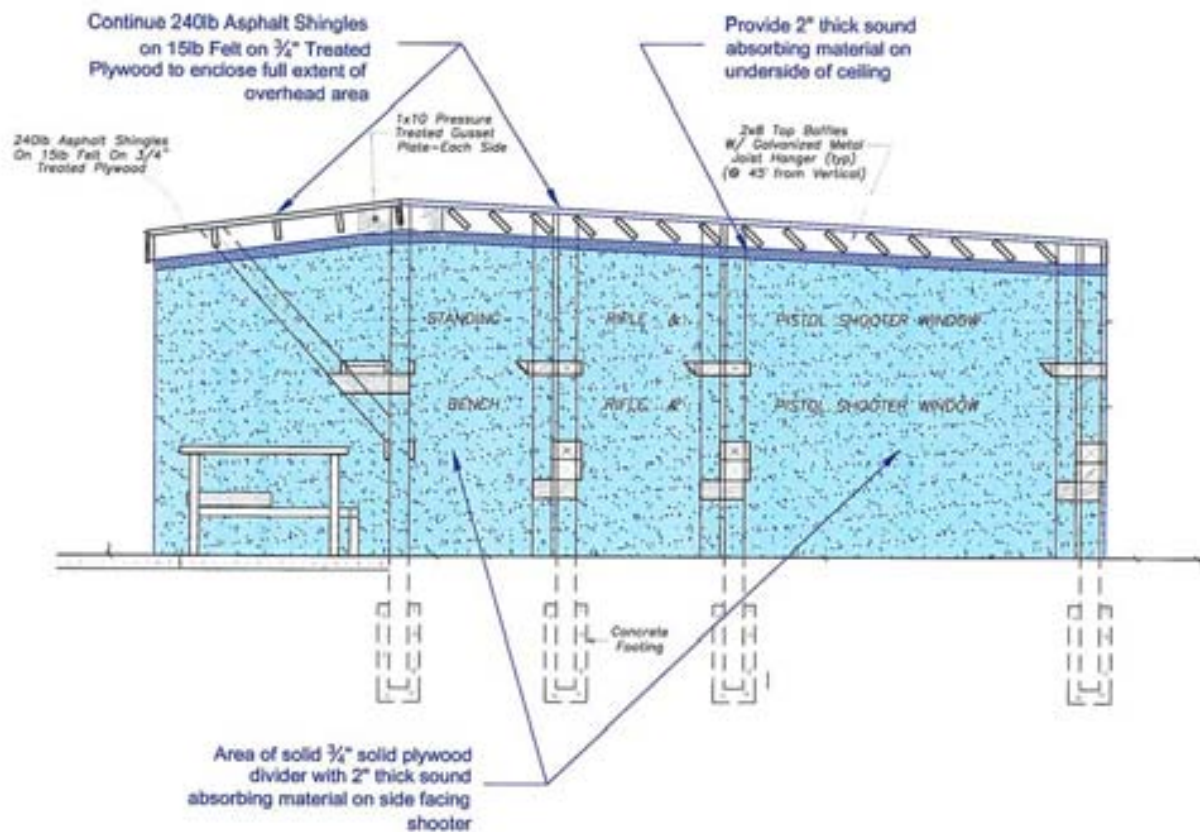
Concept section sketch through a typical shooting lane with recommended sound barrier material.
